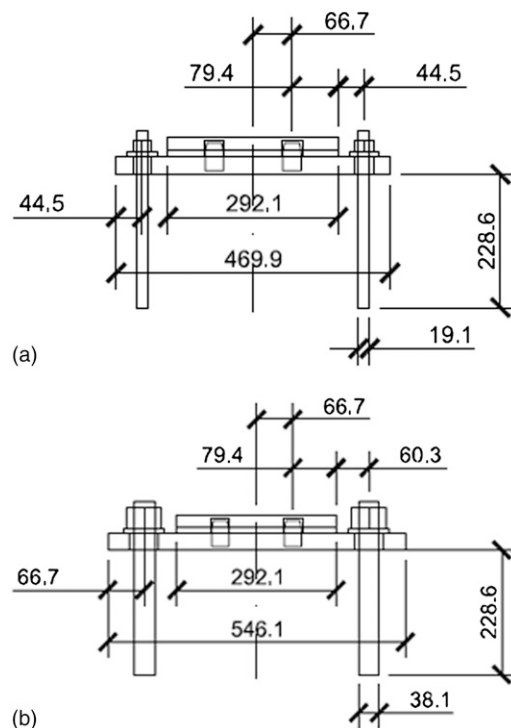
Fixed bearing section cuts parallel to bridge transverse axis (in mm): (a) weak anchors; (b) weak pintles
